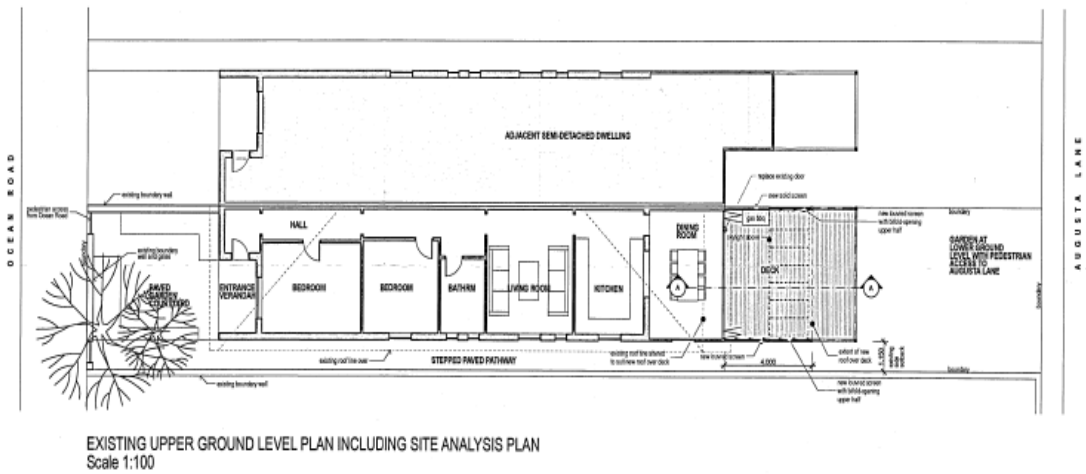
Plan of existing ground floor plan DA0151/2010 - 26 Ocean Road
